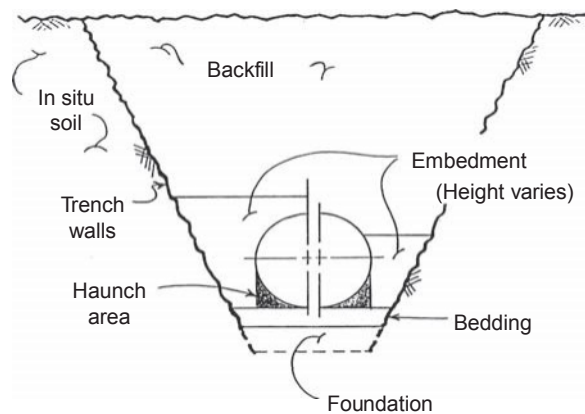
Open-cut installation. (Source: Howard, 2002)
